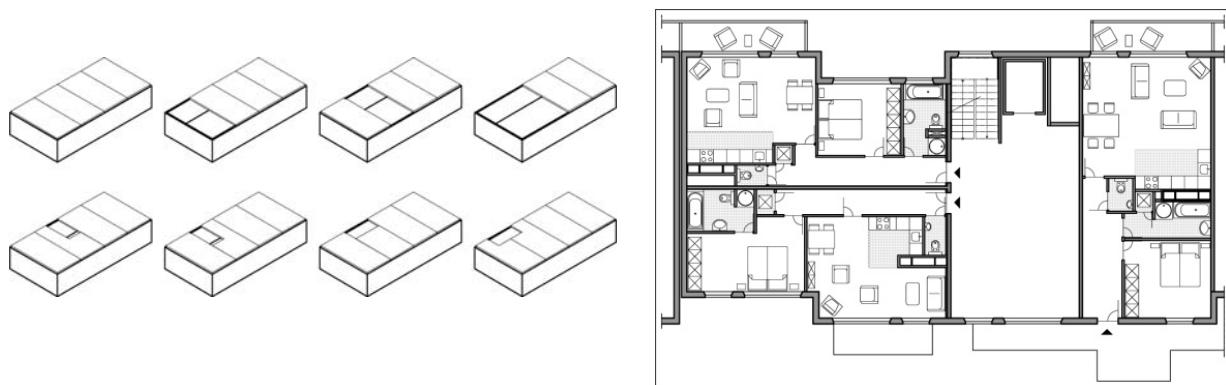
Removing (parts of) floor elements (left); New floor plans (right)
